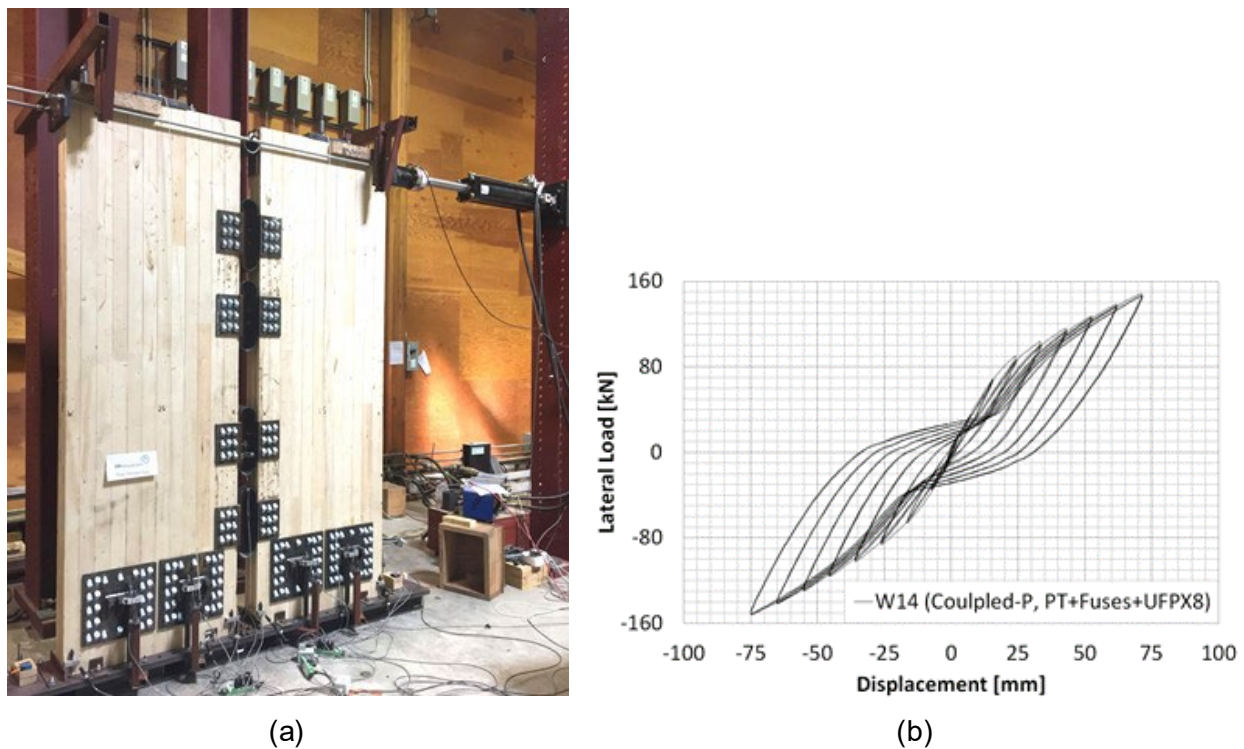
(a) Coupled Pres-Lam™ walls tested at FPIinnovations; (b) typical hysteretic curve of coupled Pres-Lam™ walls with axial fuses and U-shaped flexural plates obtained from the testing.
